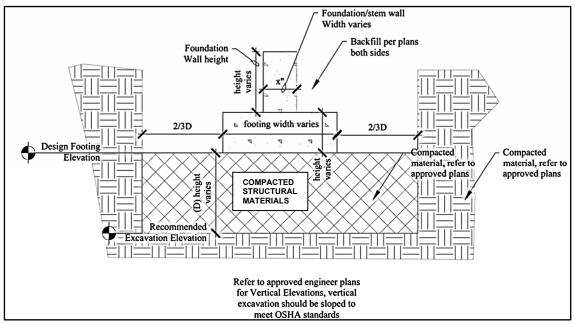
Foundation Trench Backfill Detail for Select Soil Fill
